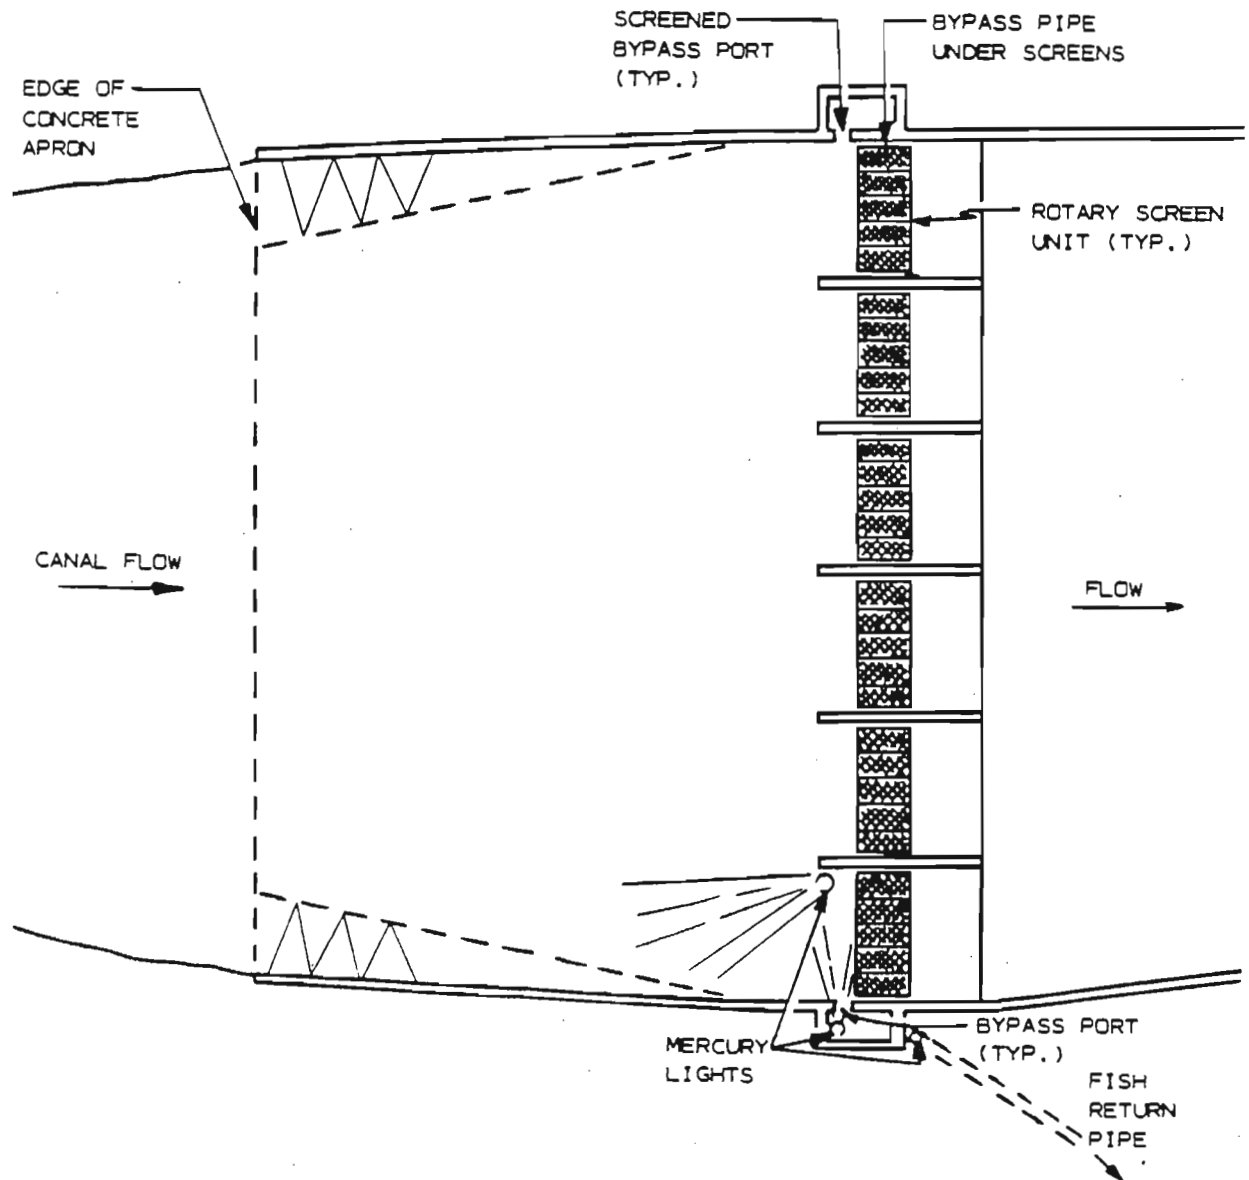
Plan view of the mercury light arrangement at the Wapatox Canal test site.
